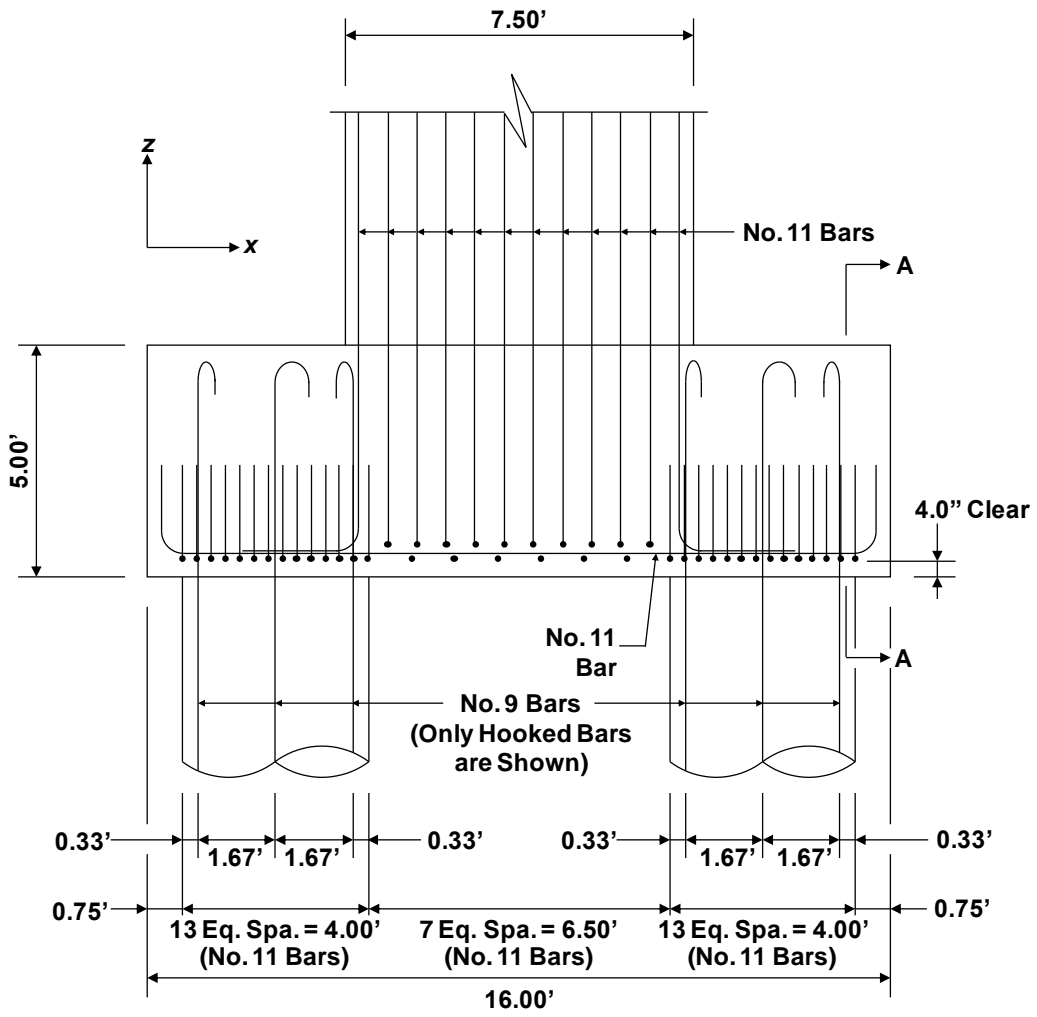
Reinforcement details – elevation view (main reinforcement)
